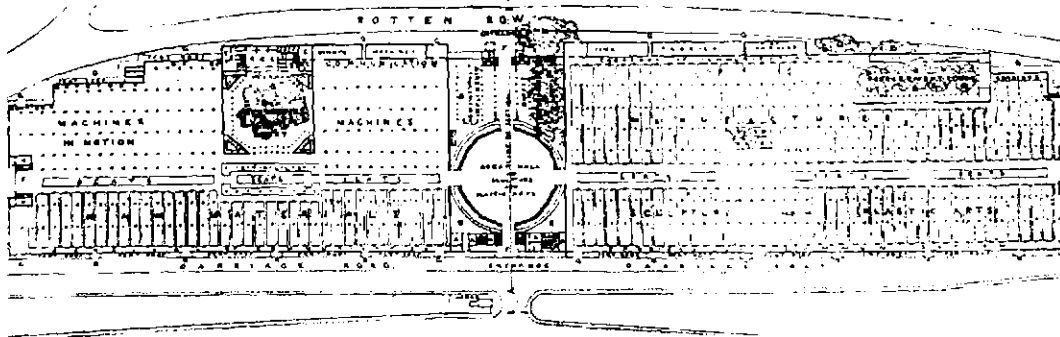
TOP Plan and elevation, Building Committee's scheme
